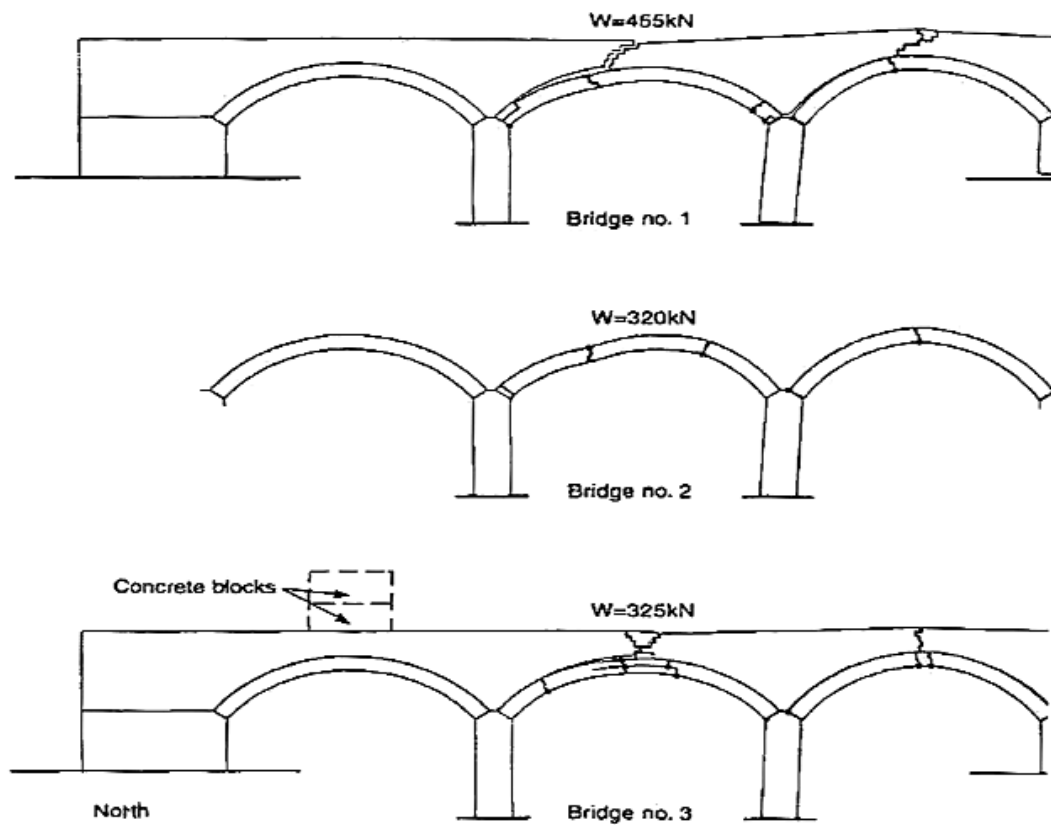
Multi span failure mechanism, taken from [Melbourne et al., 1997]
